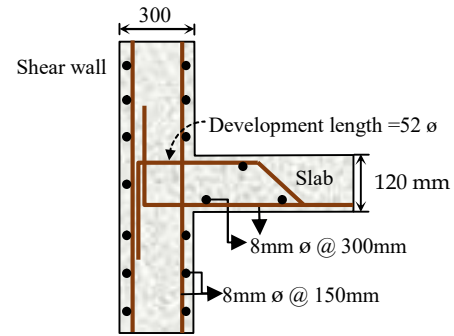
Detailing of reinforcement at shear wall - slab junction.
